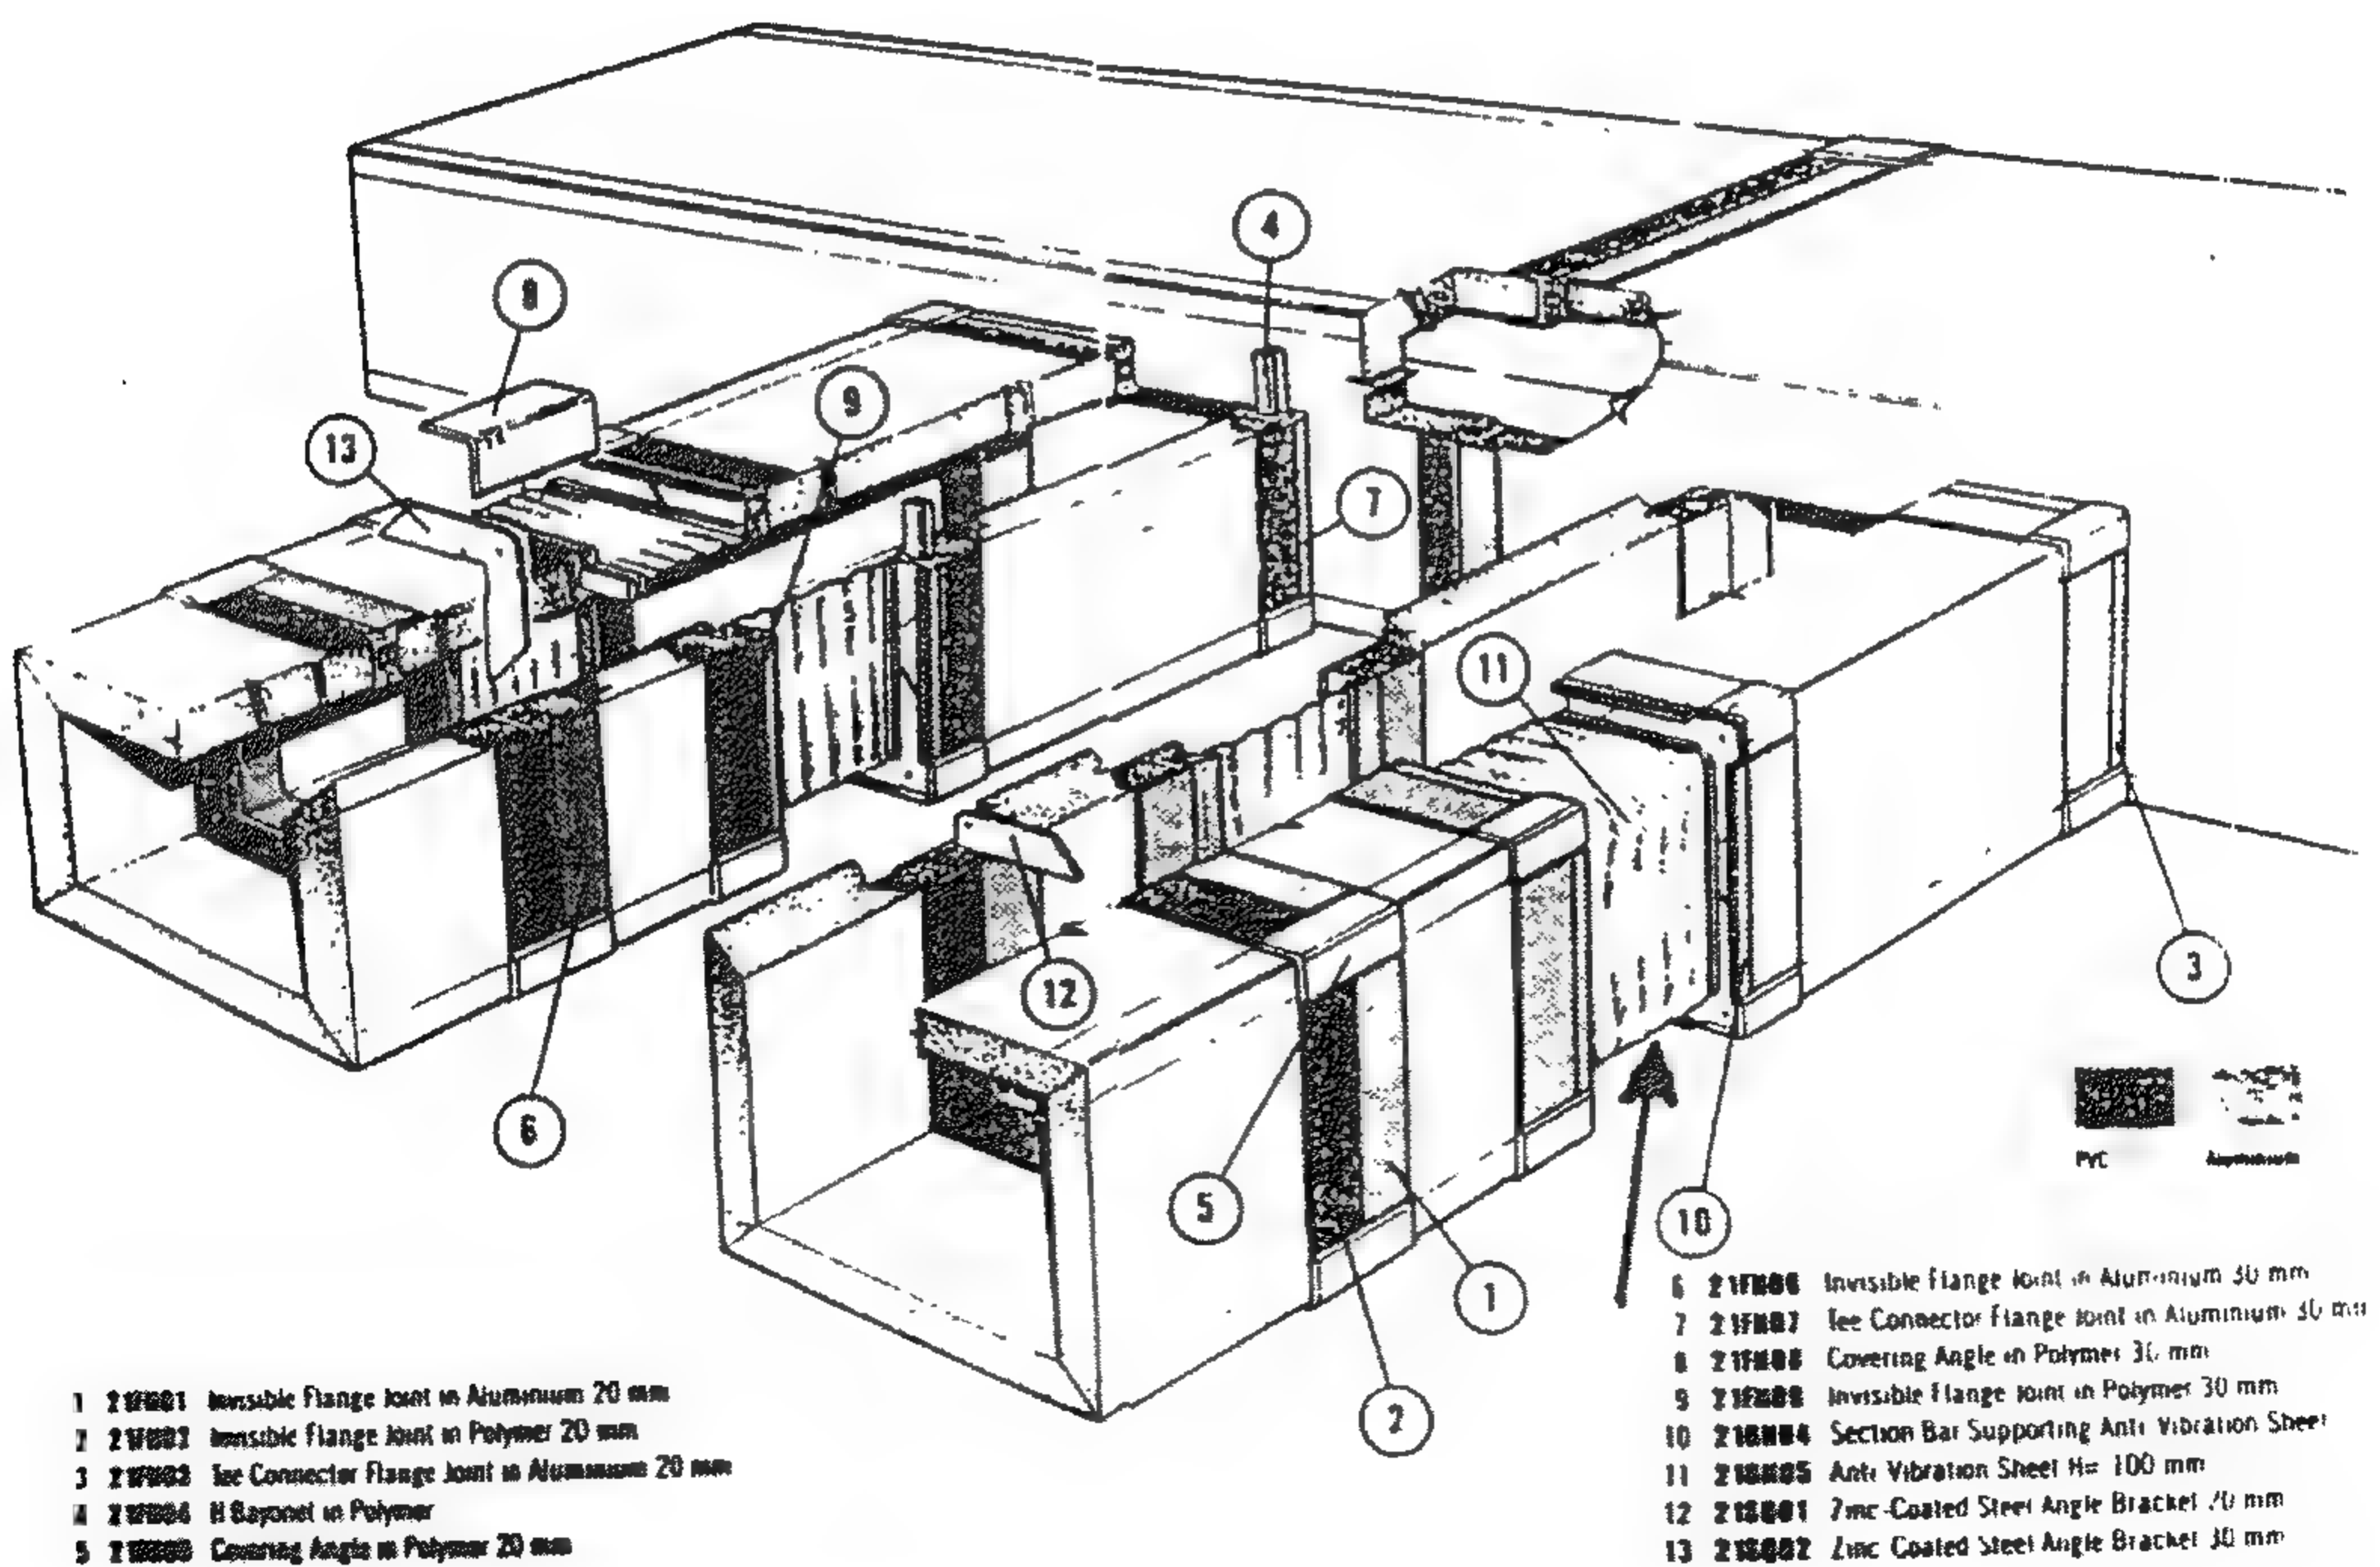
Anti- vibration sheet for duct – sections connection.
